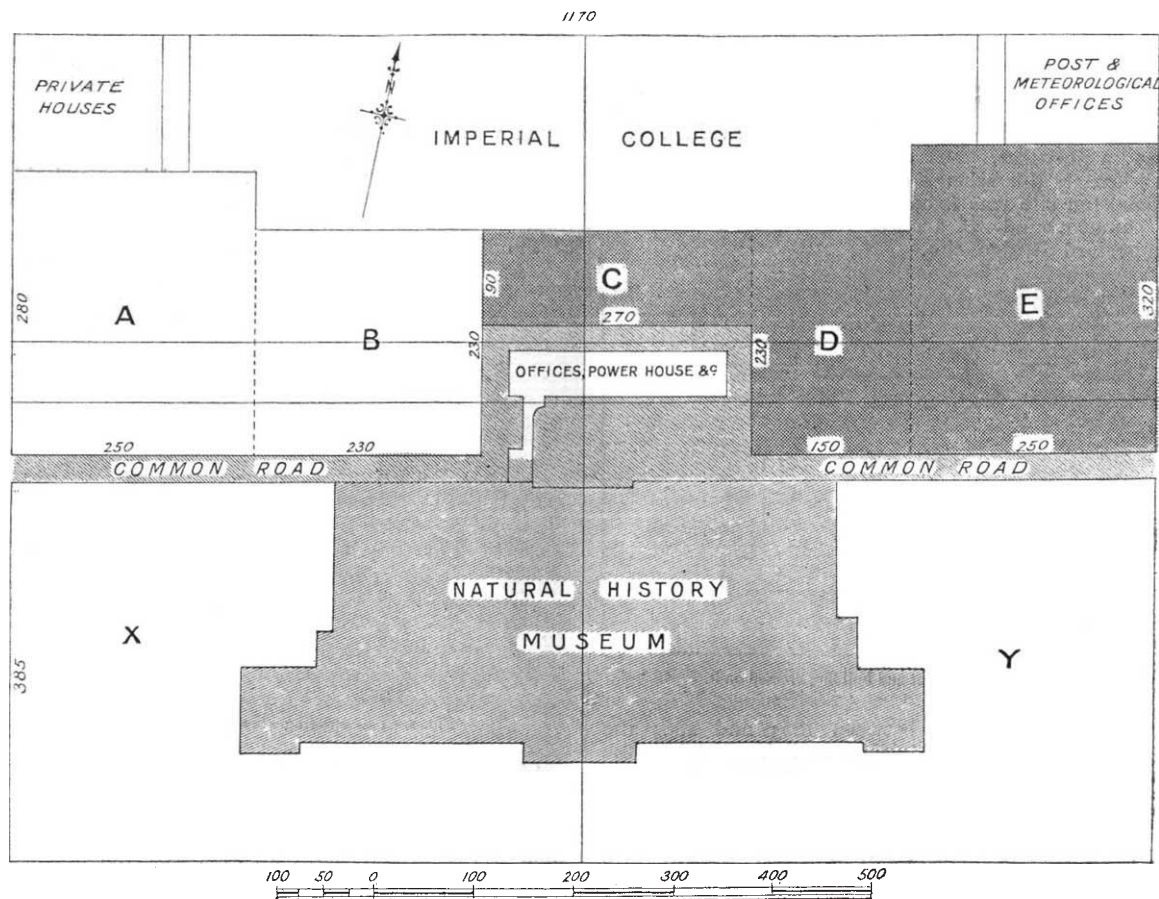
Plan showing utilisation of the existing road and spirit museum building.
